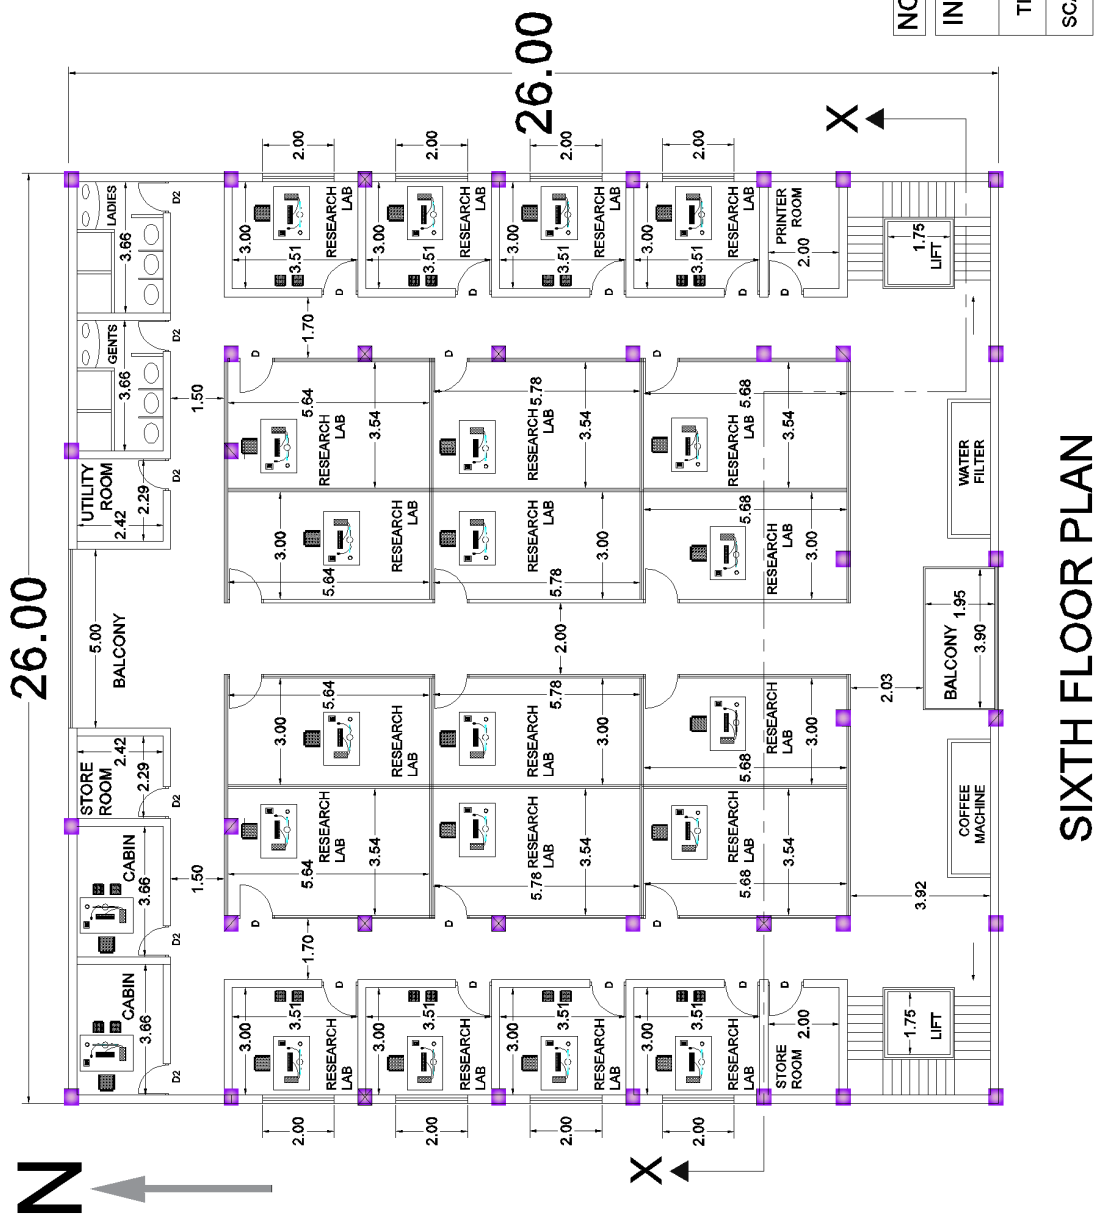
Sixth Floor - Plan of the Infrastructure for housing the Cloud Chamber Research Facility
